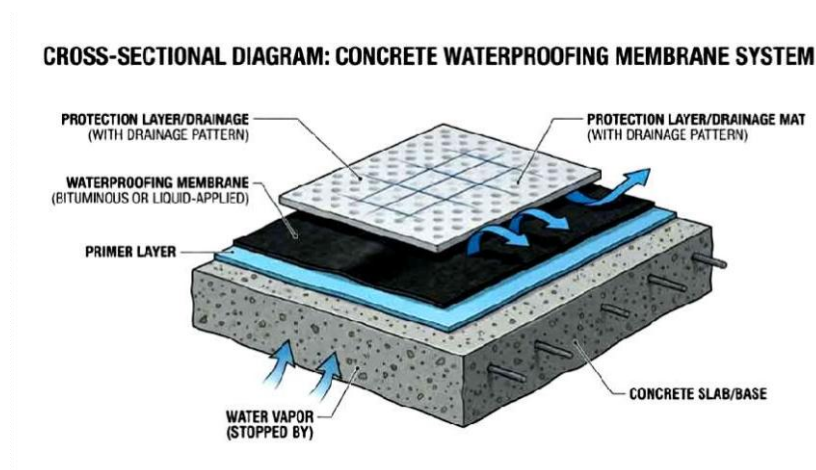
Cross-Sectional View of a Concrete Waterproofing Membrane System [41].
